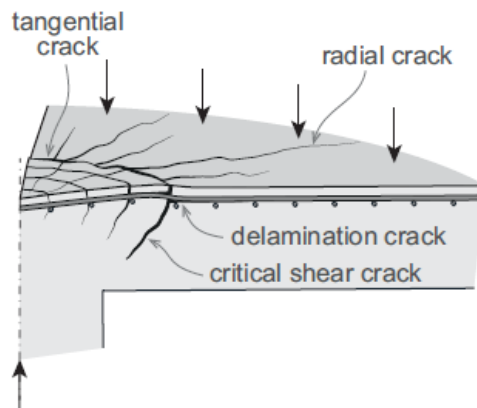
Cracking development in a slab-column connection (Aurelio Muttoni A. P., 2018)
